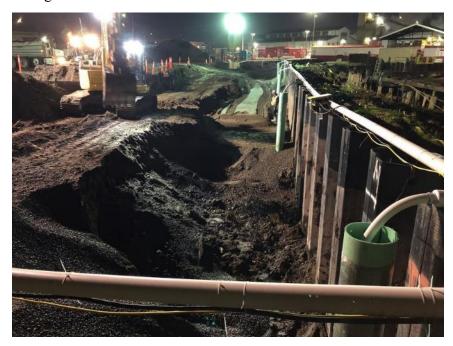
01/11/2021: Excavation extents bottom sampling in cell J-1, at elevation 4.5 ft in Estuarine Unit.
